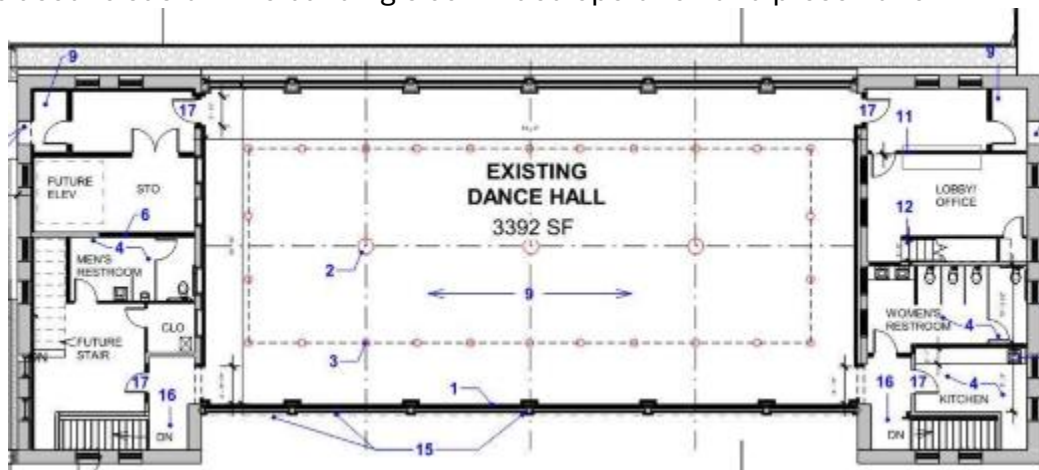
Proposed 2nd floor plan. Courtesy of Quinn Evans.
